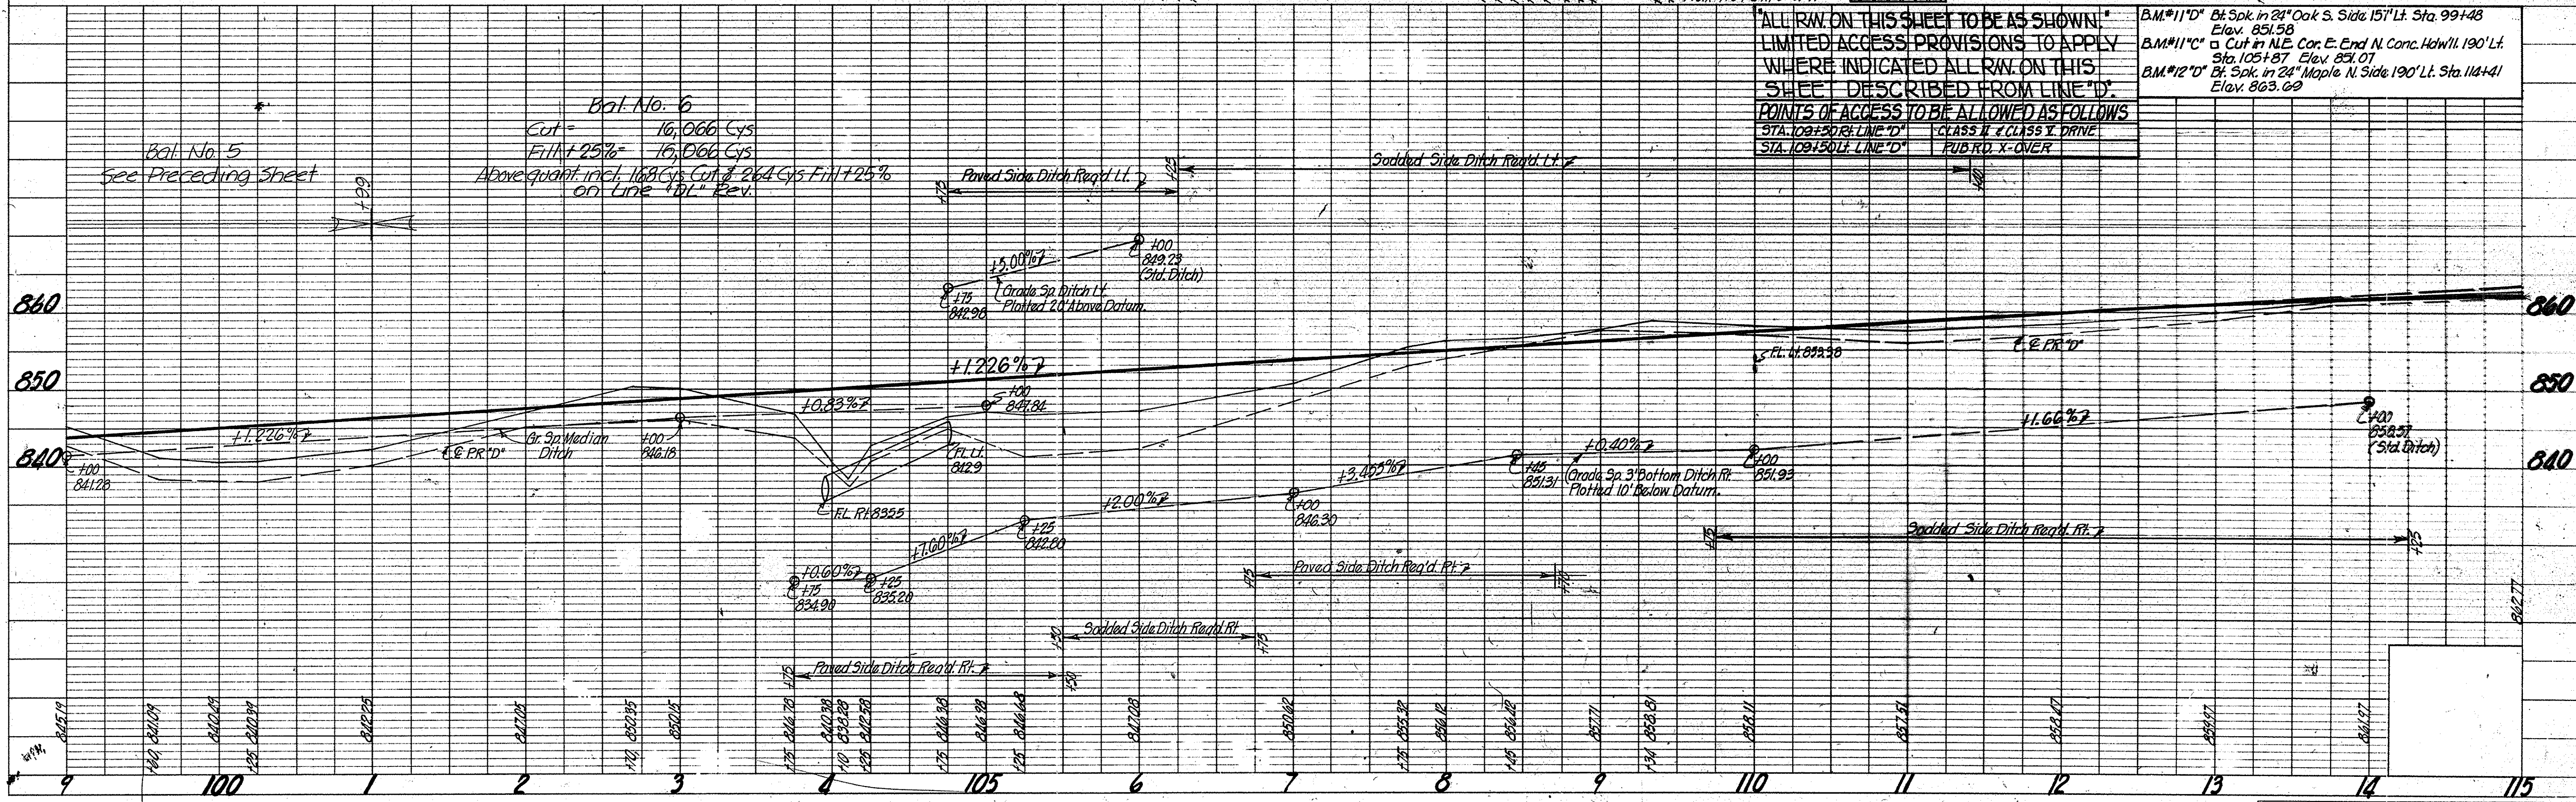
PLAN - PROFILE B. R. R. STANDARD
